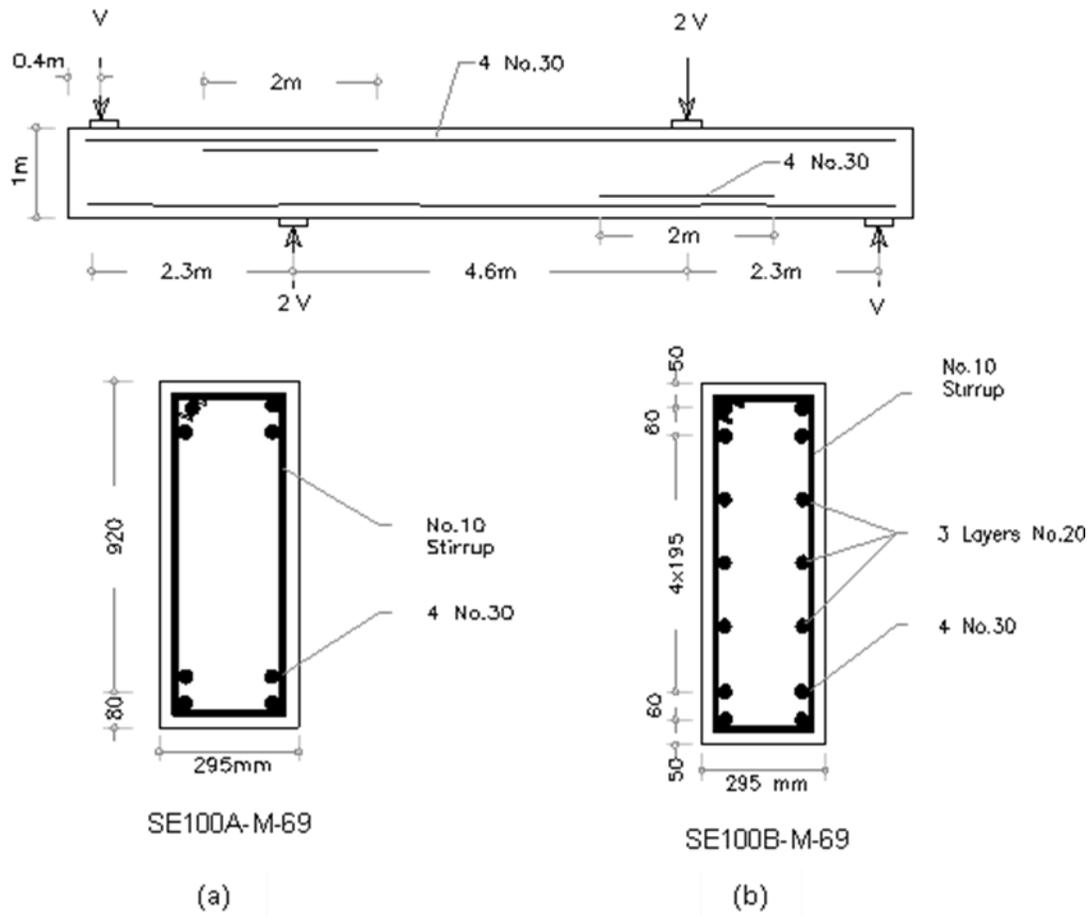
(a) Cross-section of high-strength, continuous non-prestressed reinforced concrete beam (b) Cross-section with the crack control (skin) reinforcement.
